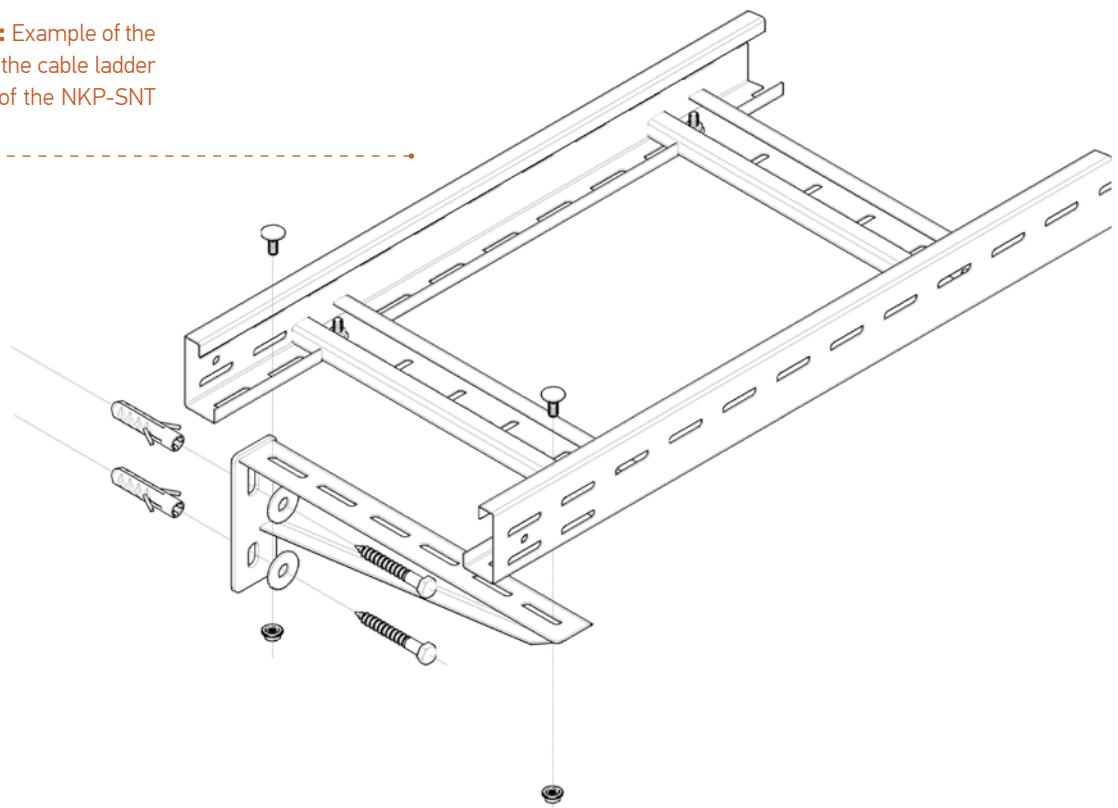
Example of the installation of the cable ladder with the help of the NKP-SNT wall bracket
